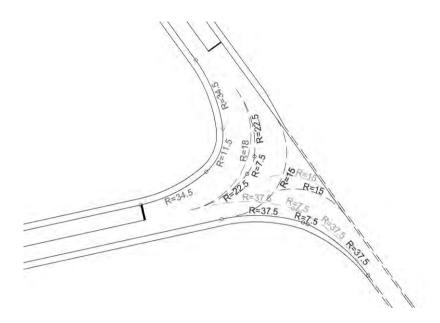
Turning Path at No.2 Intersection (Alternative-1)
